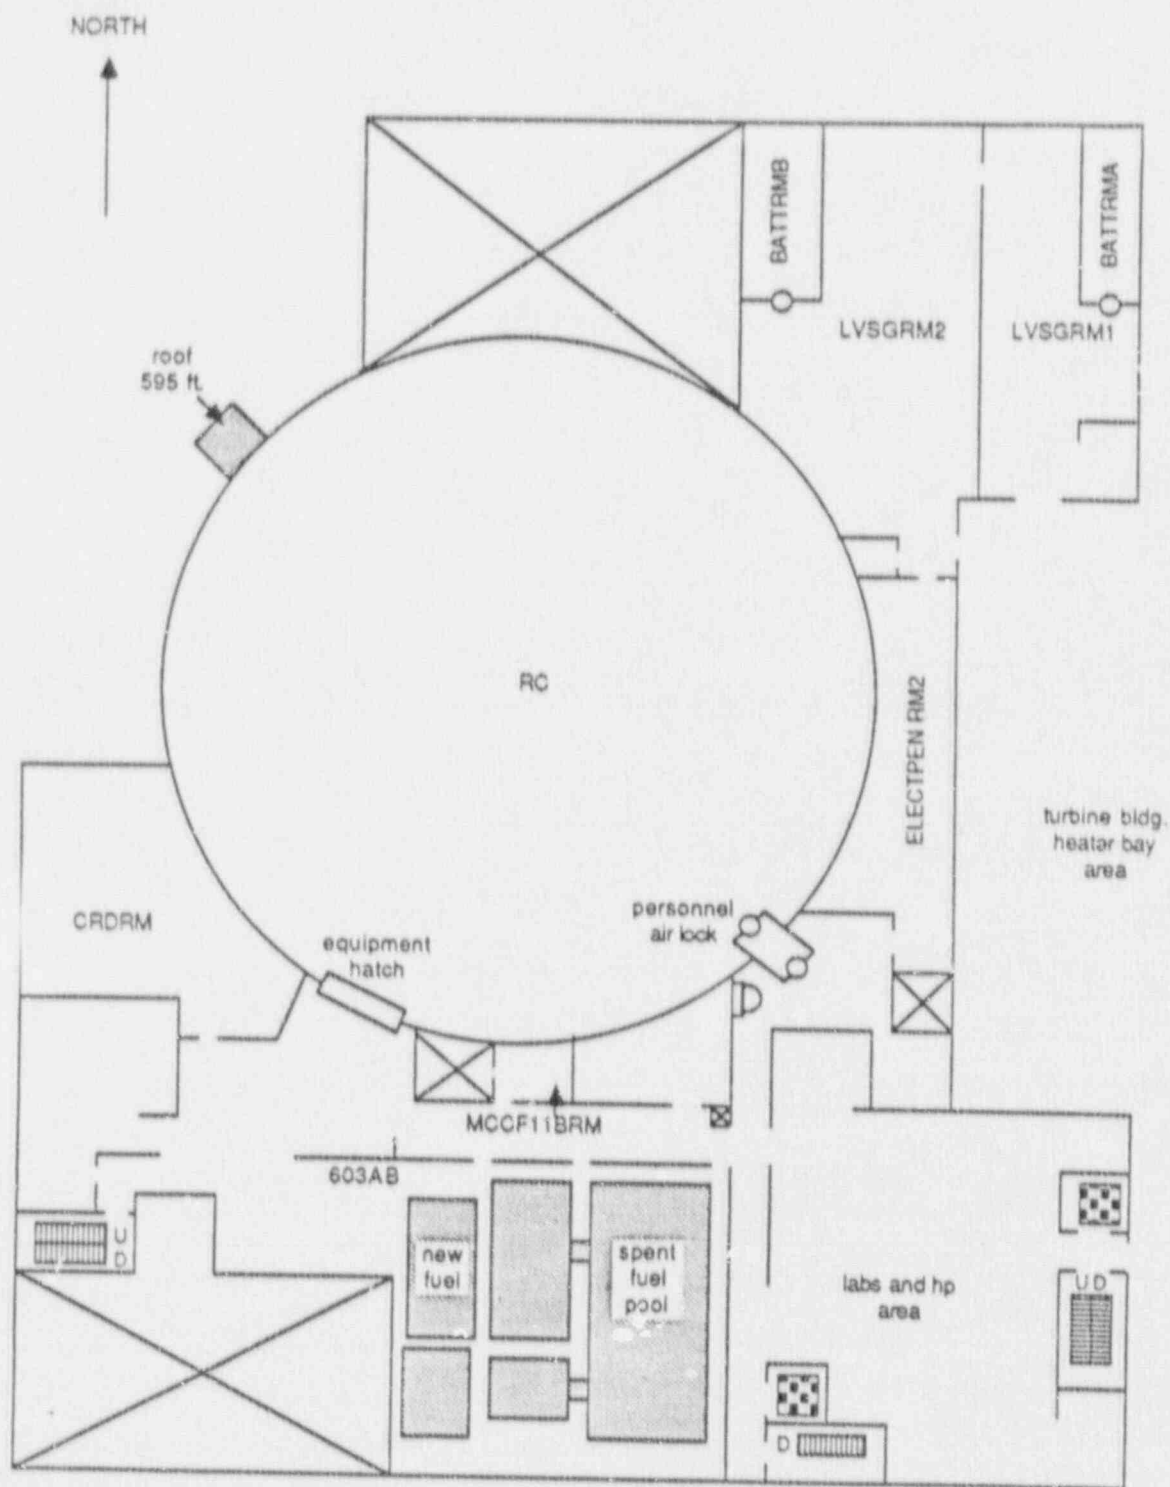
Davis-Besse Containment and Auxiliary Buildings, Elevation 603 feet
